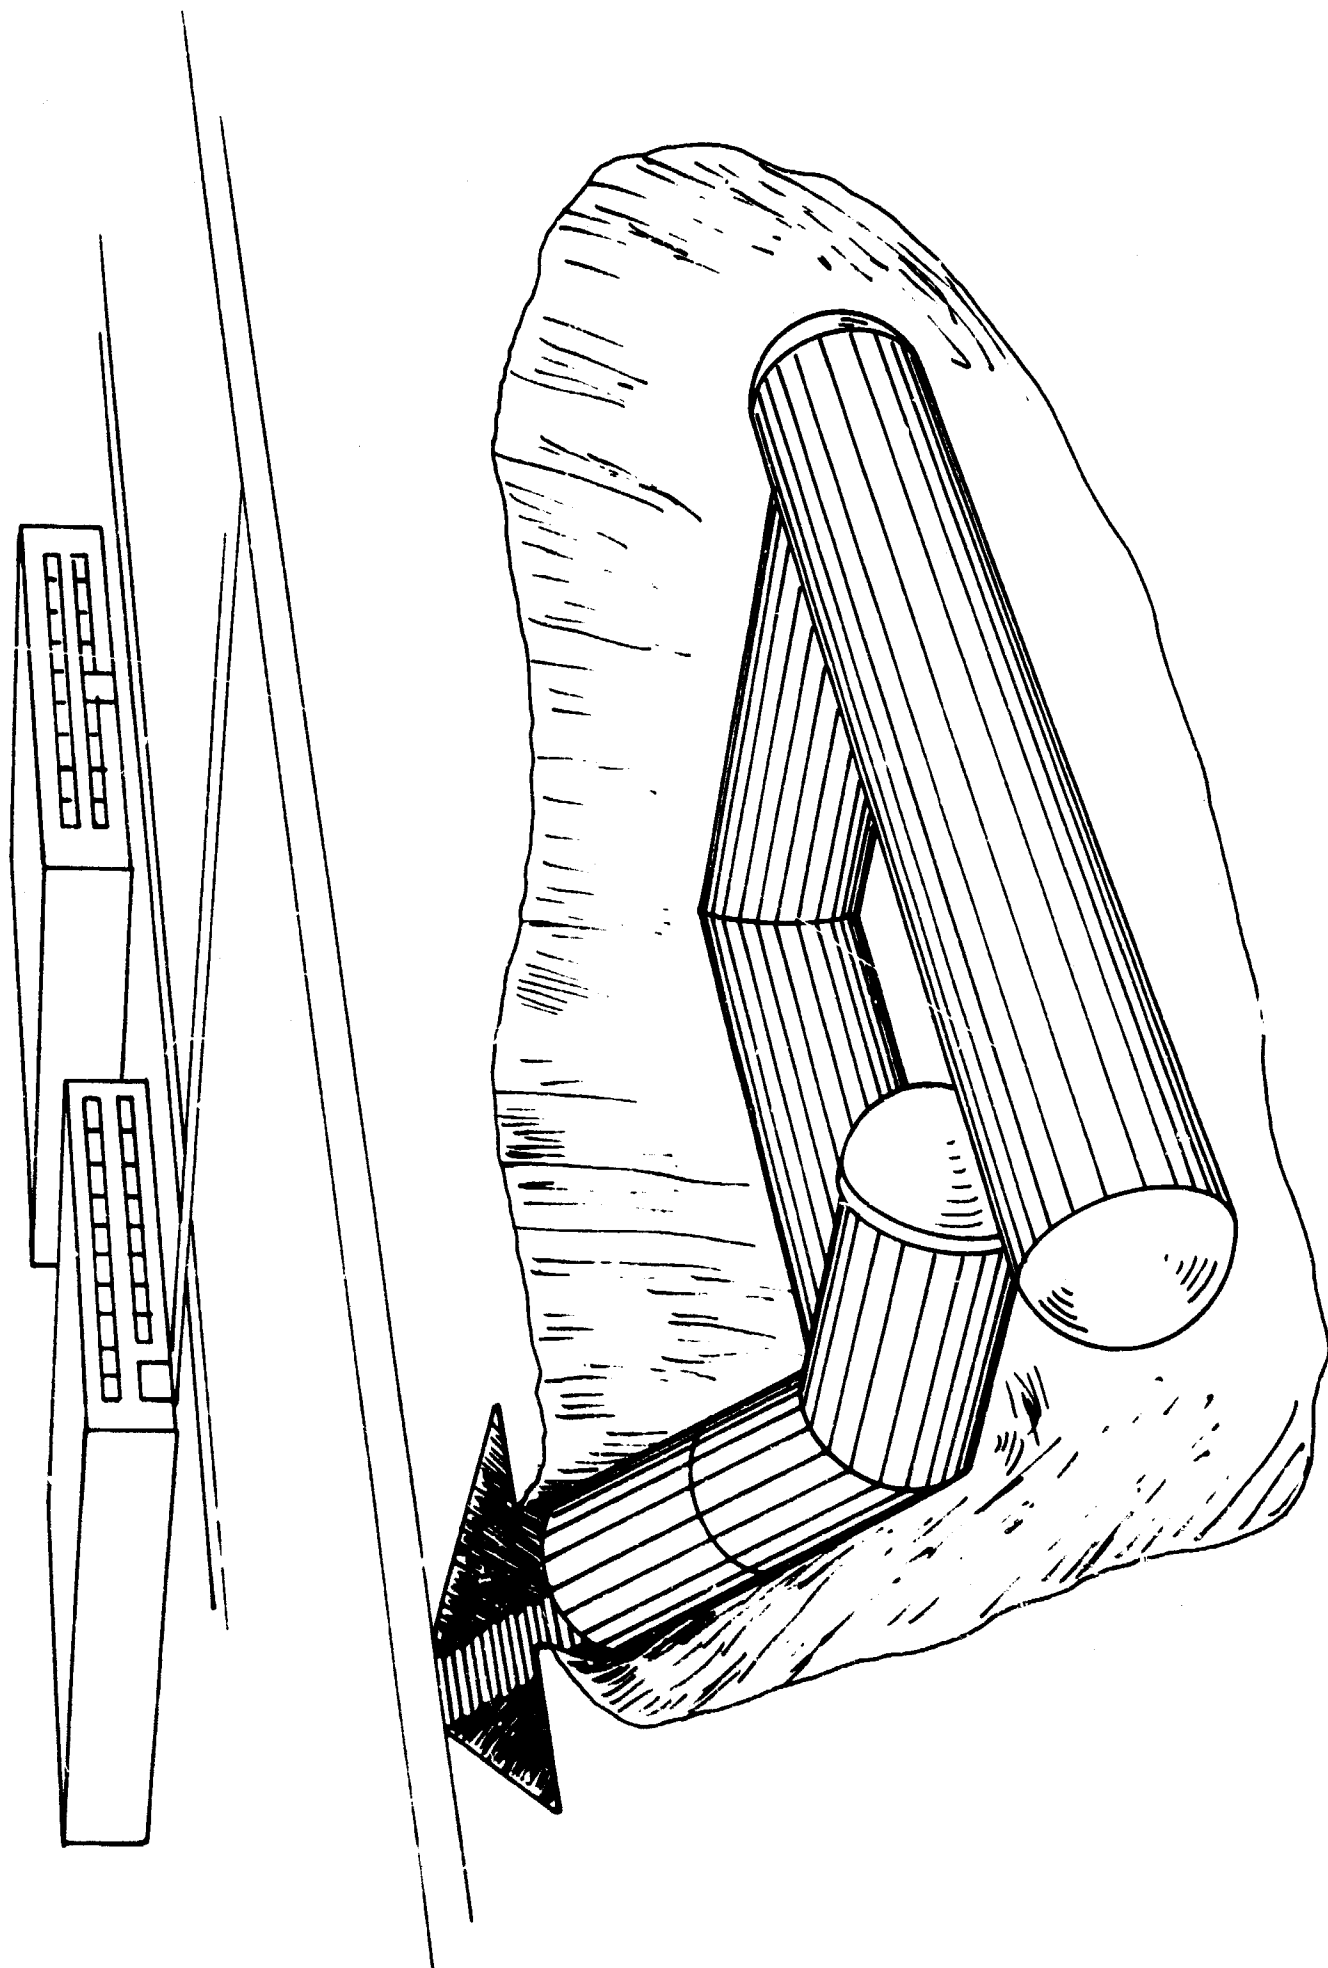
ENTRANCEWAY CONFIGURATION WITH TENSION CYLINDER BLAST SECTION
